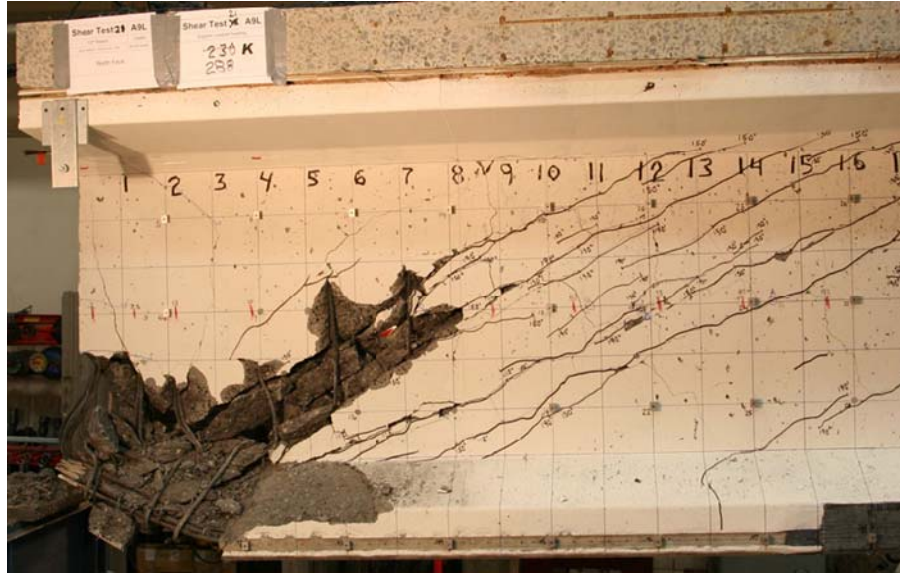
Shear Failure of Girder End A9L (Type SS)
